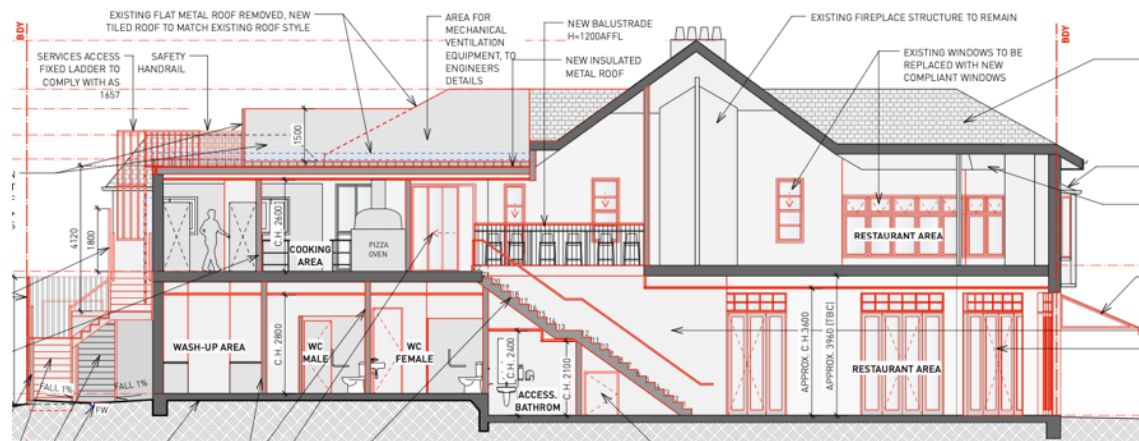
, Proposed Section A, U+I Building Studio, Mar 2021.
